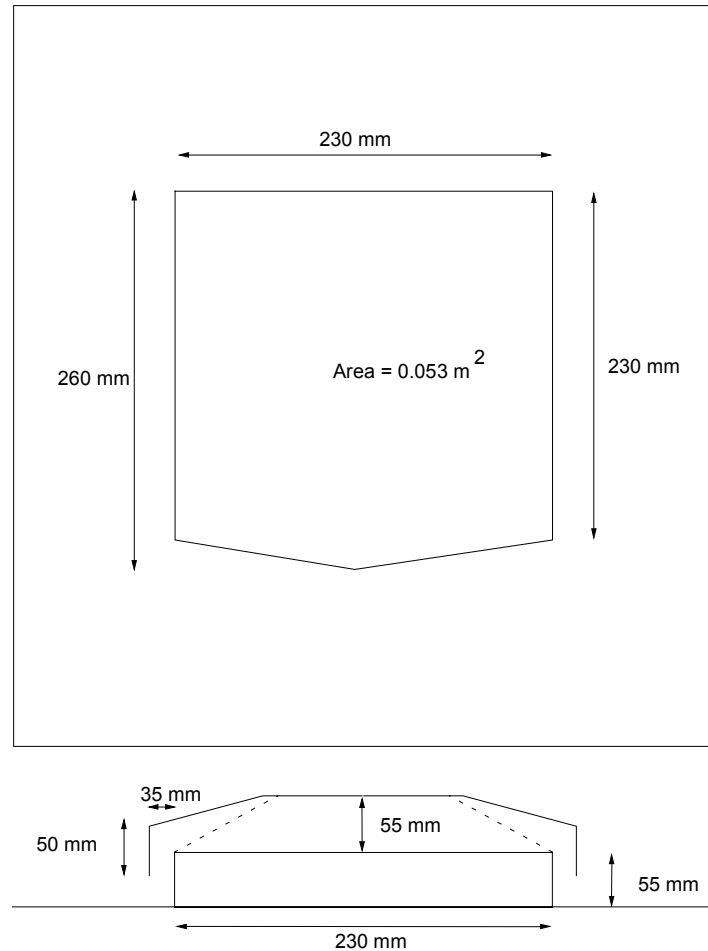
Plan and section of one of the plastic roof vents used both in laboratory tests and in the tests at the OATS.
